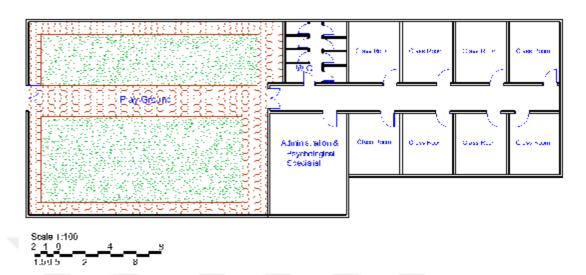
Floor plan of Misrata A Kindergarten (Drawn by author)
